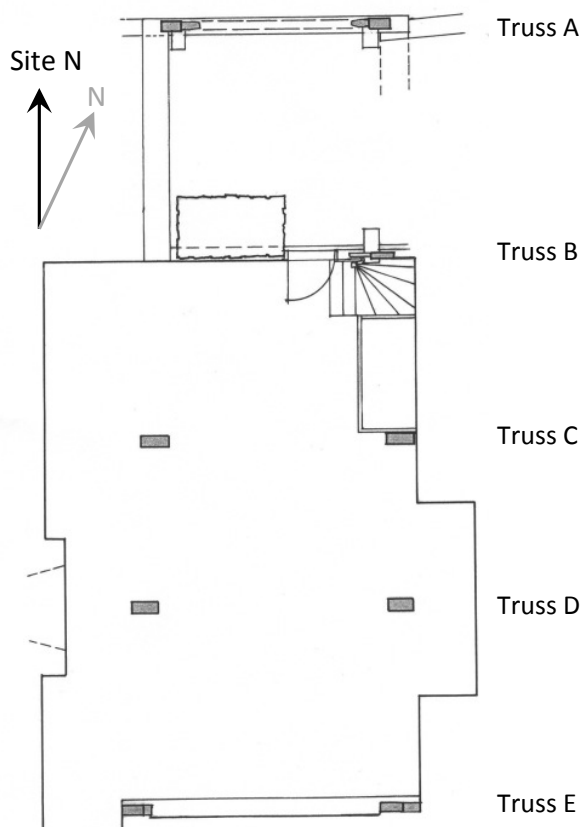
Basic plan of the roof showing the truss locations in the open hall and attic
